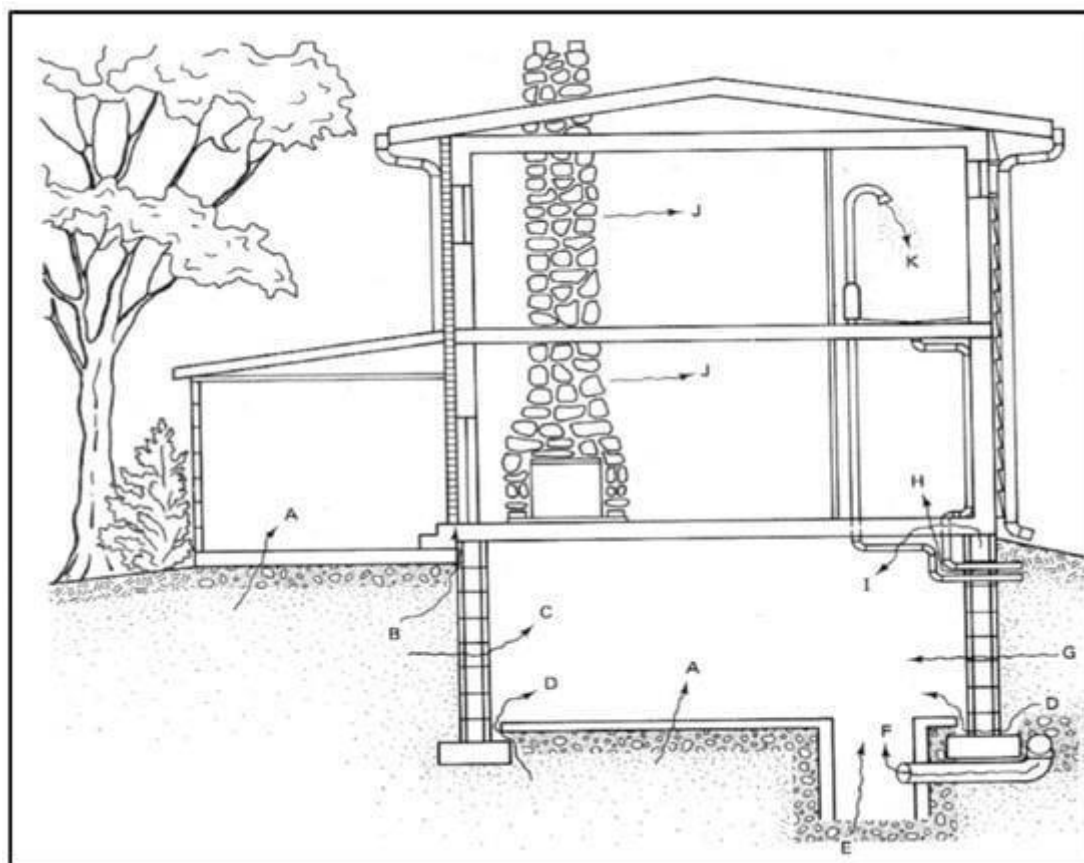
Mechanisms of entry of radon gas into buildings; A, cracks in concrete slabs; B, spaces behind brick veneer walls that rest on hollow block foundations; C, pores and cracks in concrete blocks; D, floor–wall joints; E, exposed soil, as in a sump; F, weeping (drain) tile, if drained to open sump; G, mortar joints; H and I, cracks at the junction/corner points of pipes and concrete blocks; J, building materials, such as certain rocks; K, water (from some wells).
